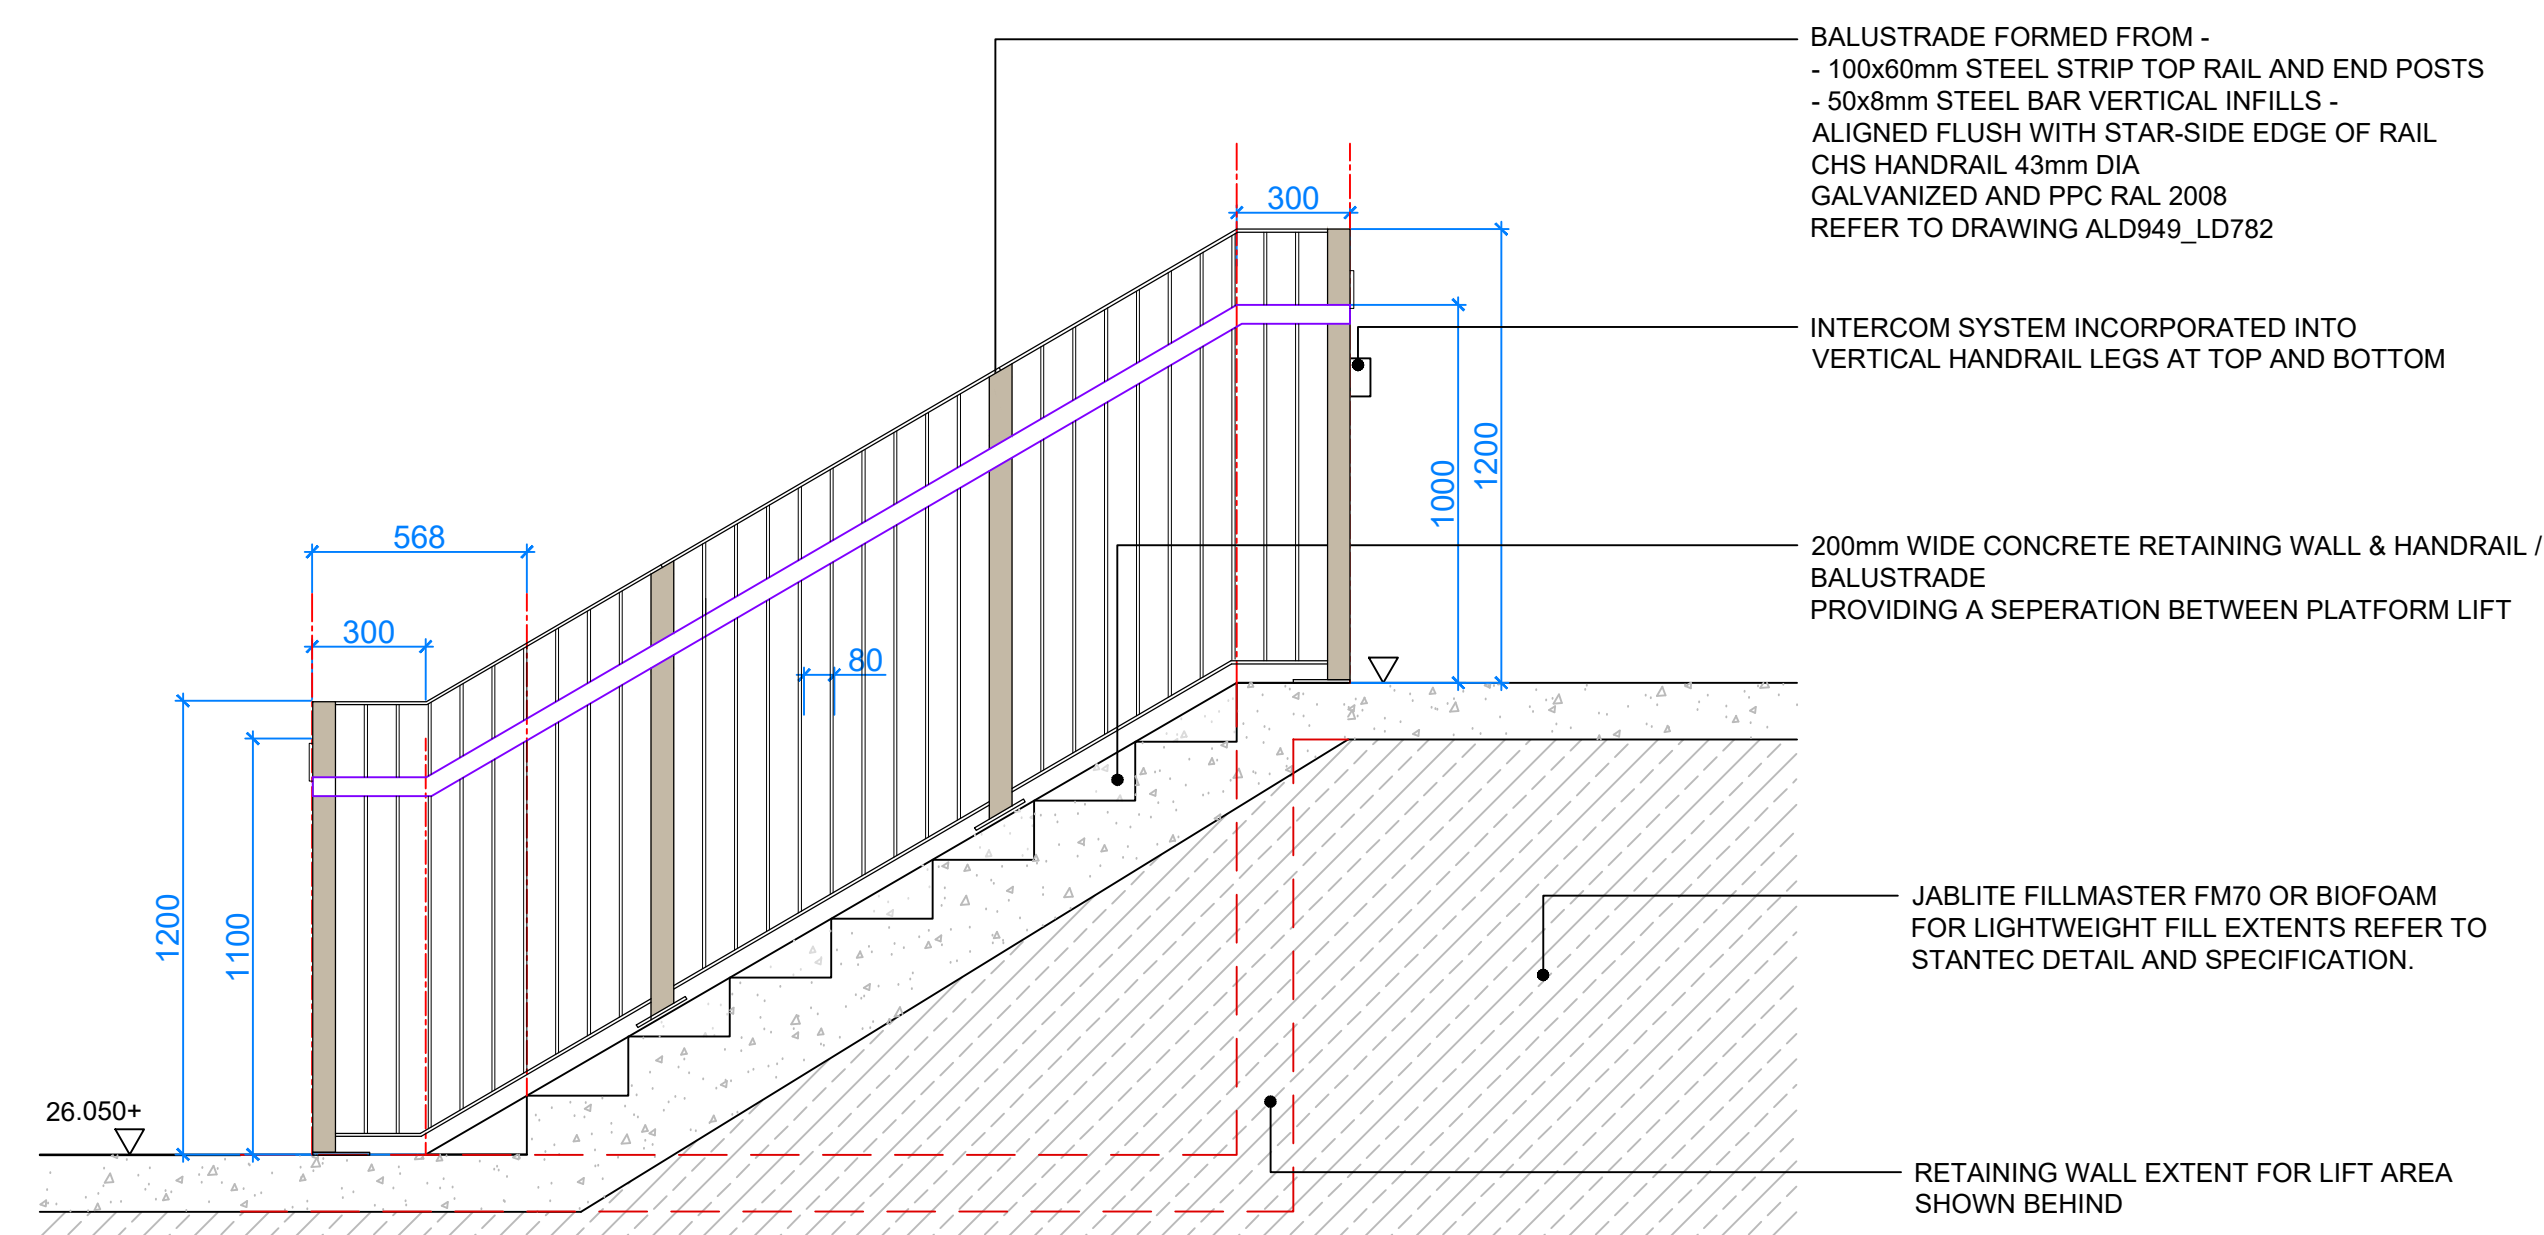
CONCRETE STEPS, HANDRAIL & LIFT ELEVATION
